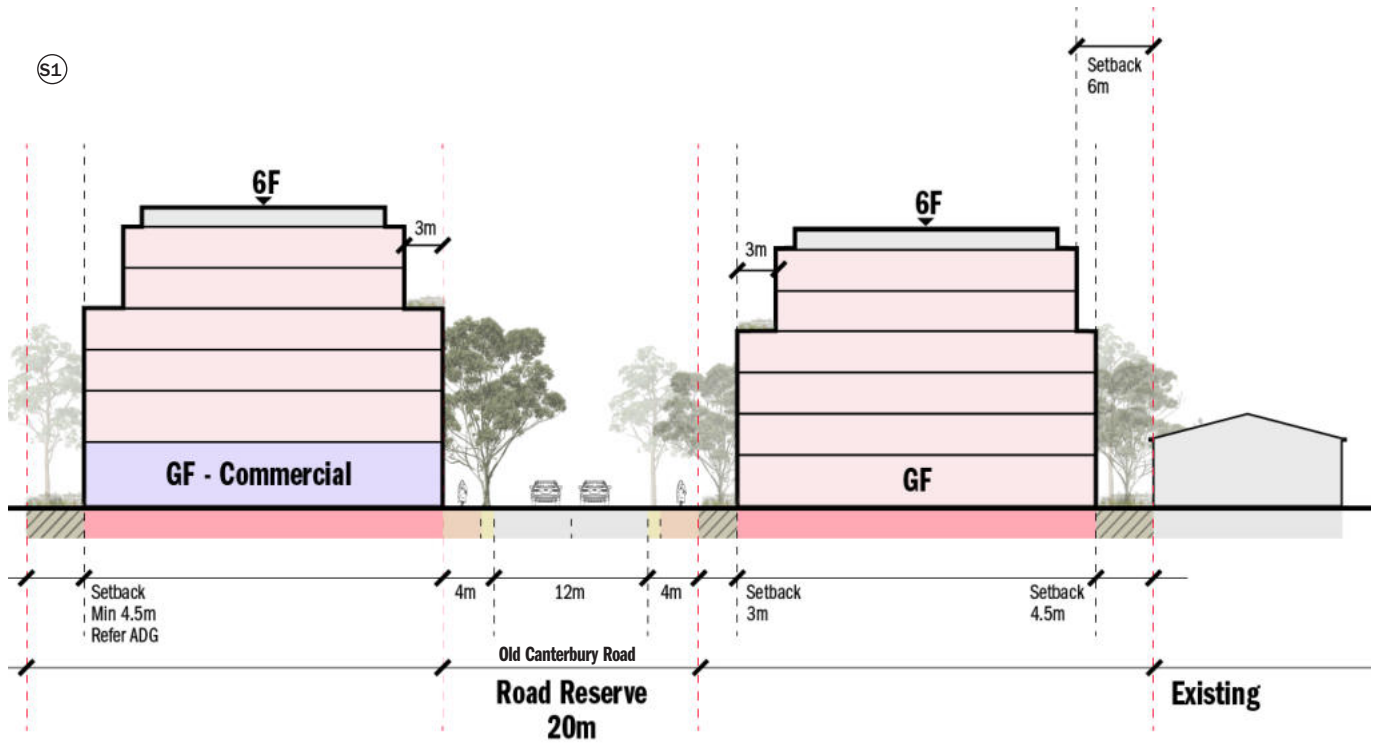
Section 1 - Section through Old Canterbury Road showing a six storey building with commercial uses on the ground floor, and a six storey residential building
